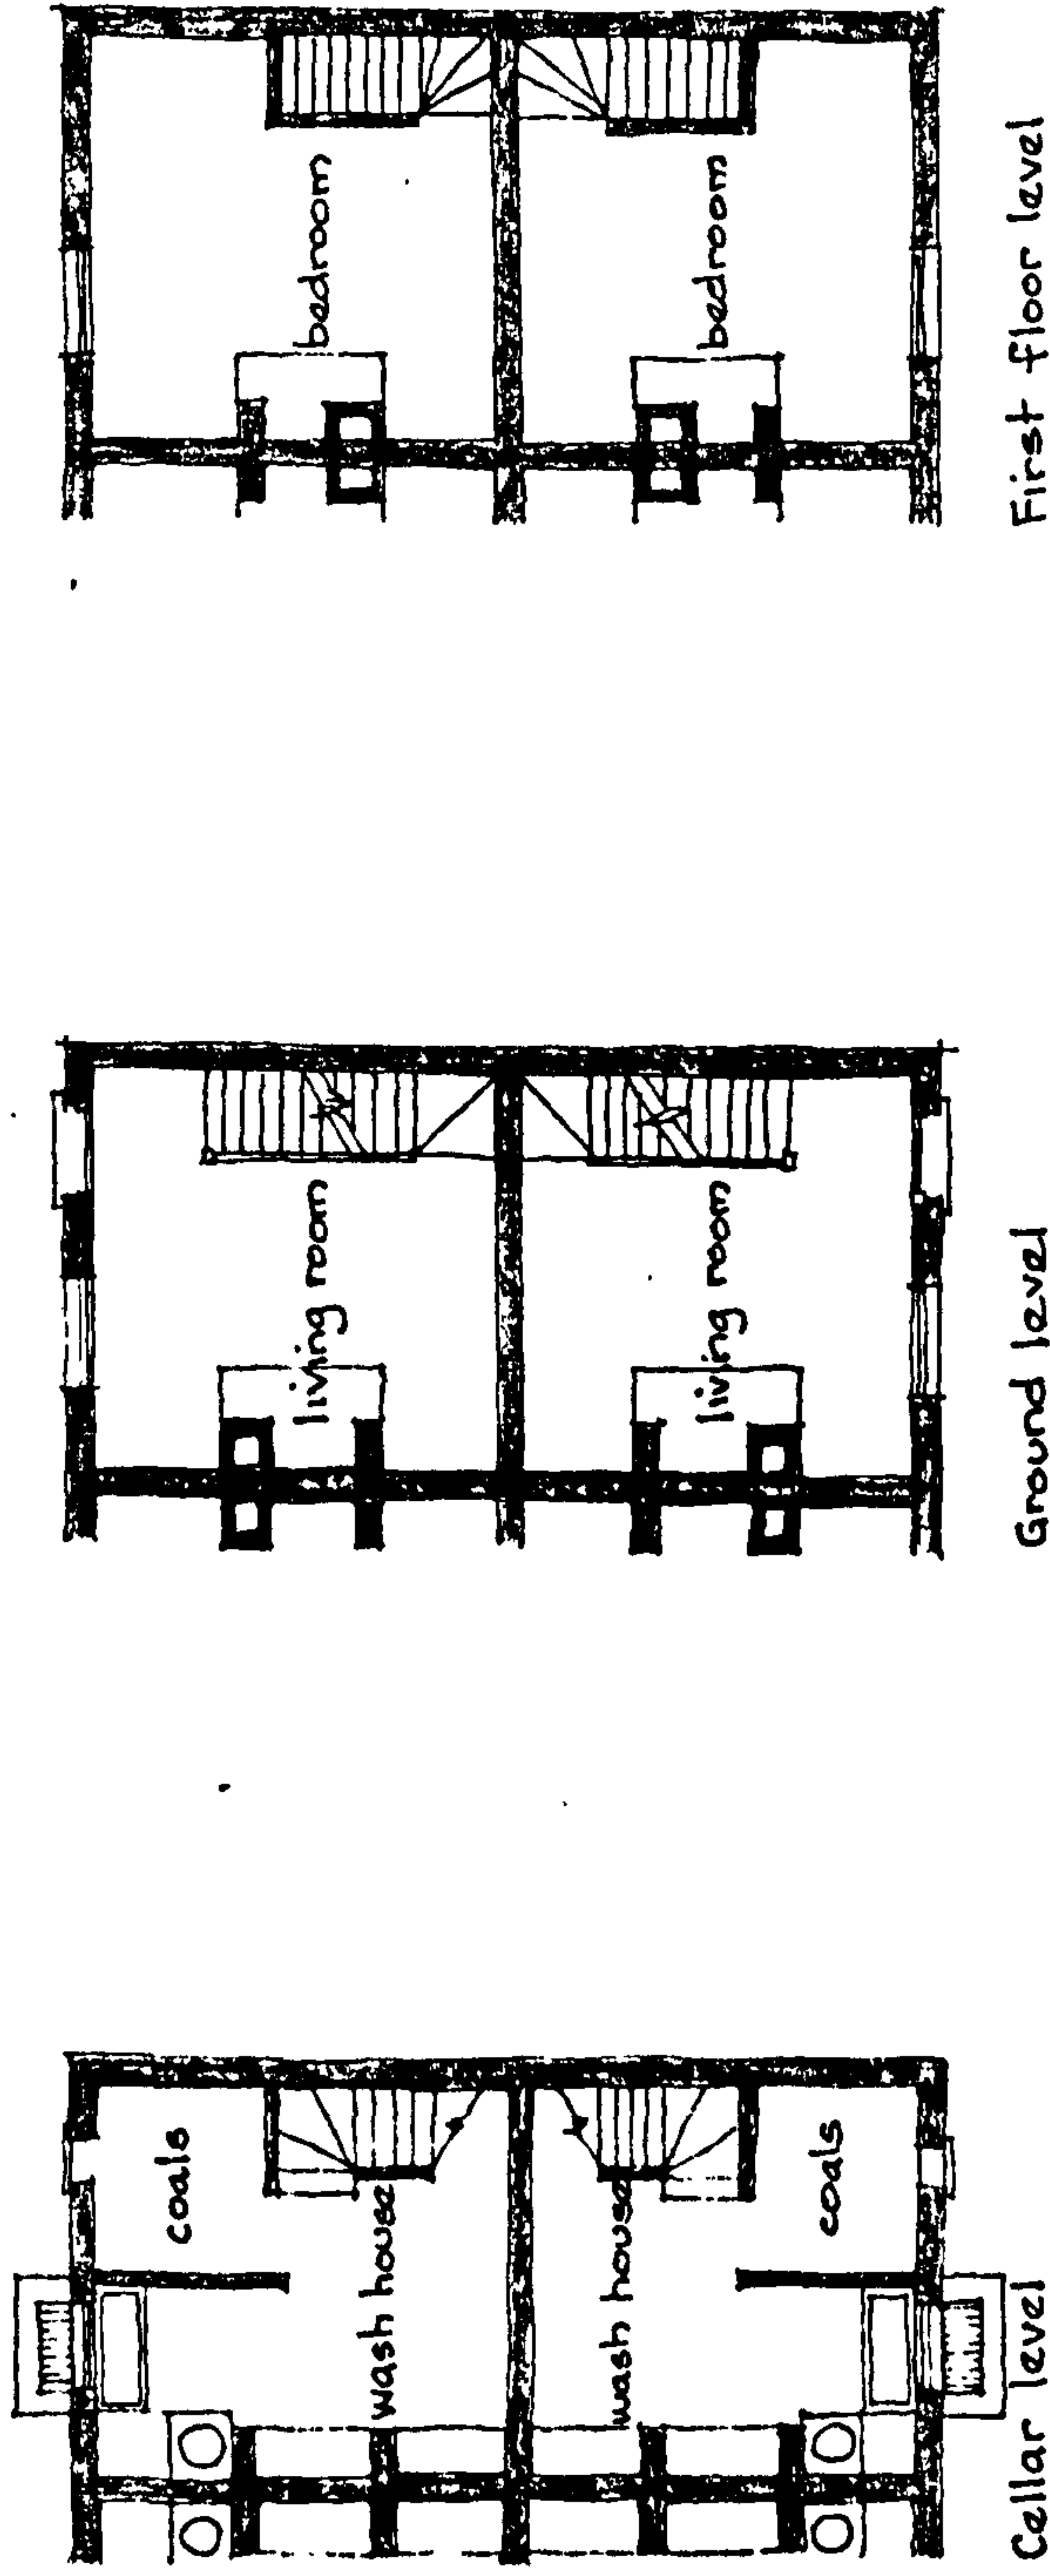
Floor plans of typical scullery back-to-back dwellings erected in the study area (A.E. Braithwaite 1894).
